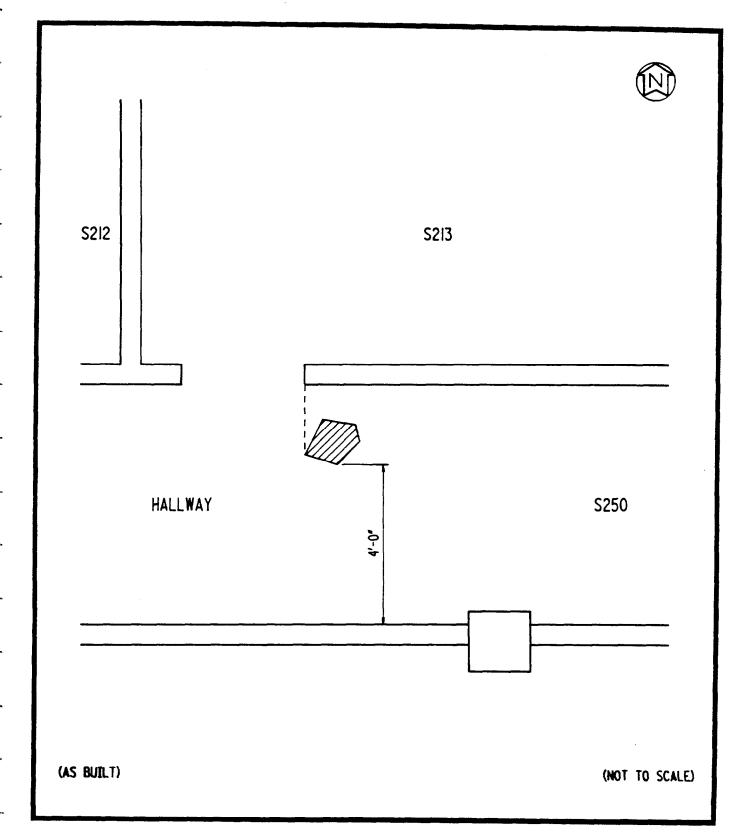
HALLWAY OUTSIDE ROOM S213—AREA WHERE REMEDIAL ACTION WAS PERFORMED ON THE FLOOR
